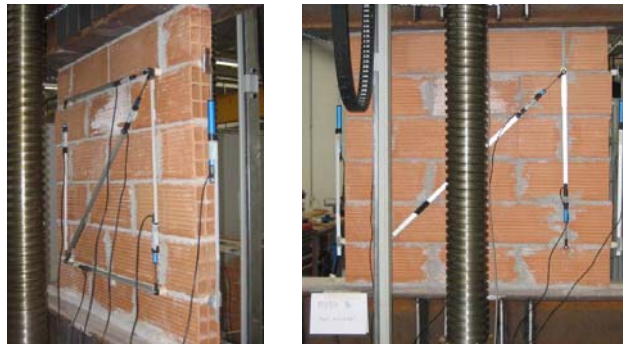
equipment for compression test orthogonal to holes on hollow brick walls (front and back view of the panel)
